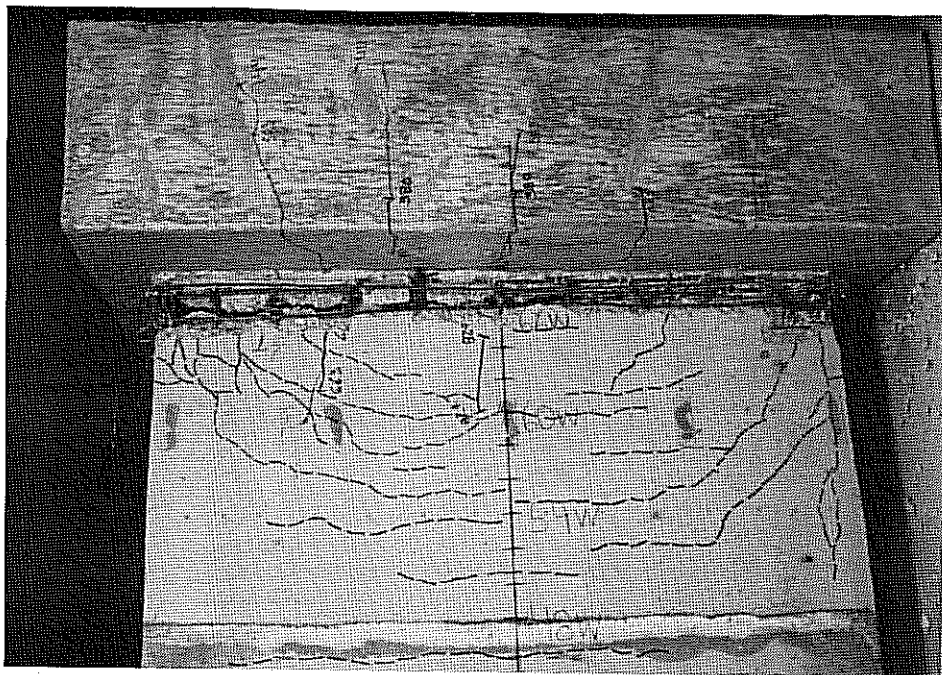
Specimen 8ML25 Compression Flange Close-Up
